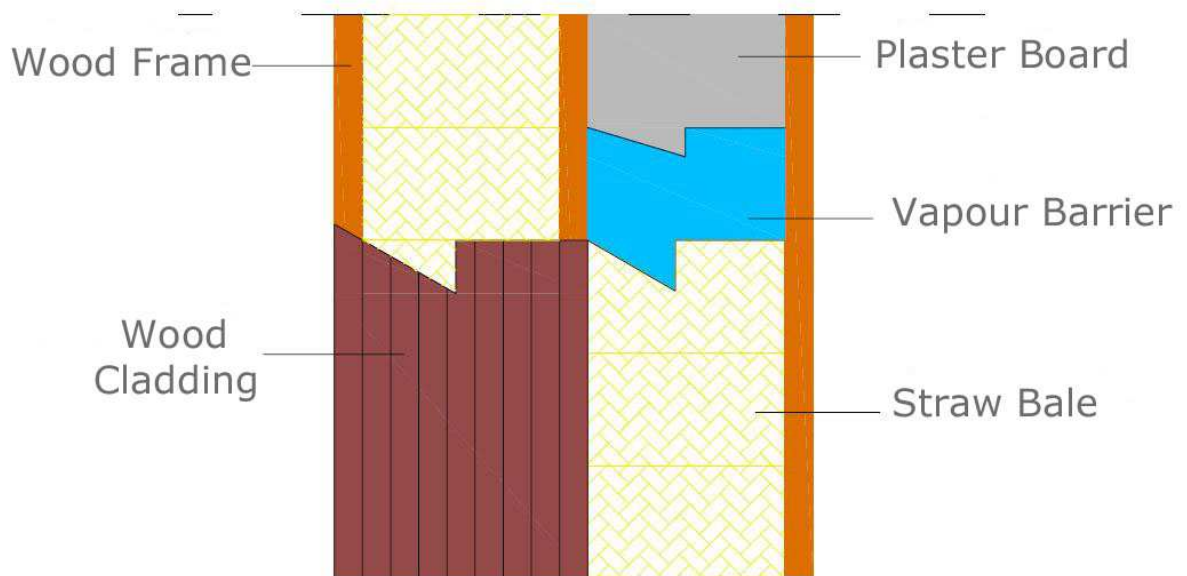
Superposition of Various Layers in a Straw Wall with a Wood Frame
